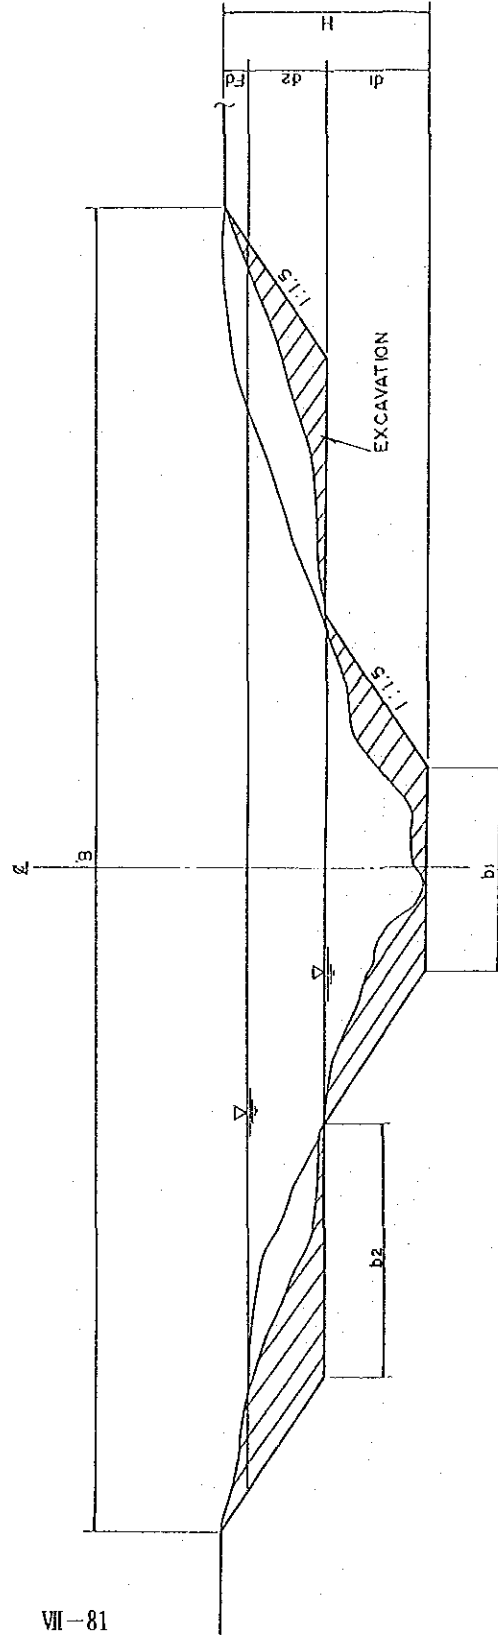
TYPICAL CROSS SECTION OF PROPOSED DRAINAGE CANAL
